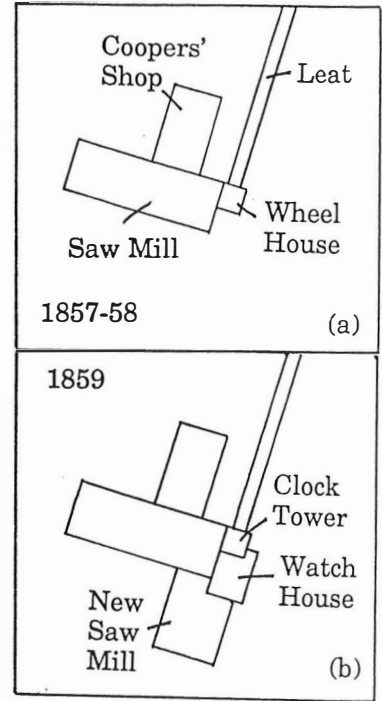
Sketch plans of the buildings of the tower complex in 1857-58 and 1859.
